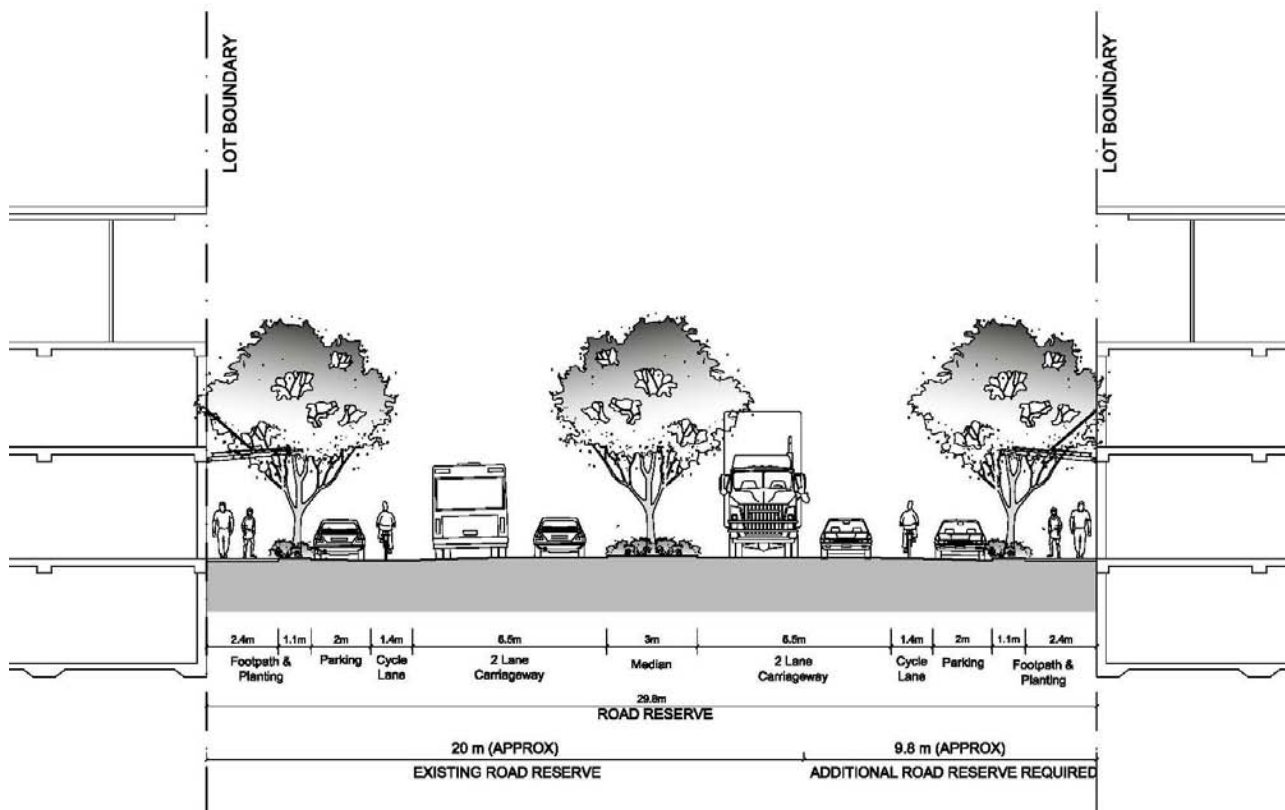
Edmondson Avenue Austral Town Centre Section B
